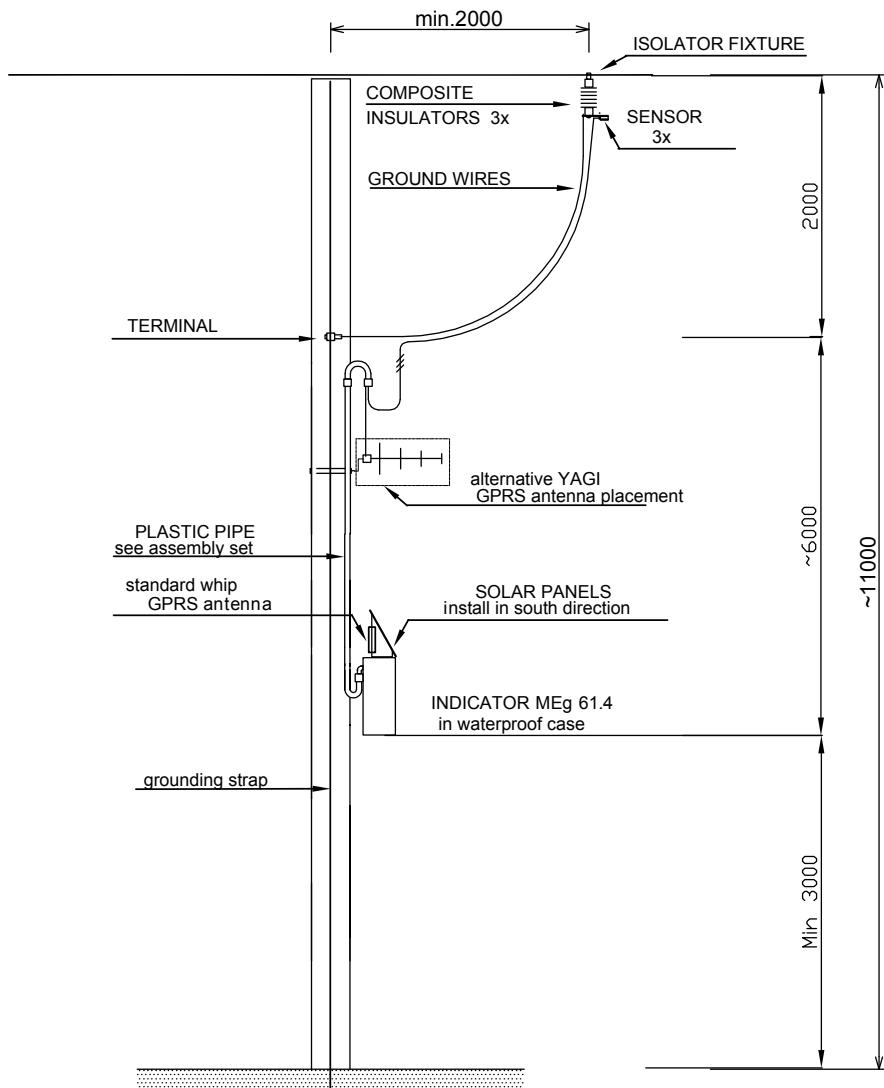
Case with solar panels of the assembly set of the indicator MEG61.4
